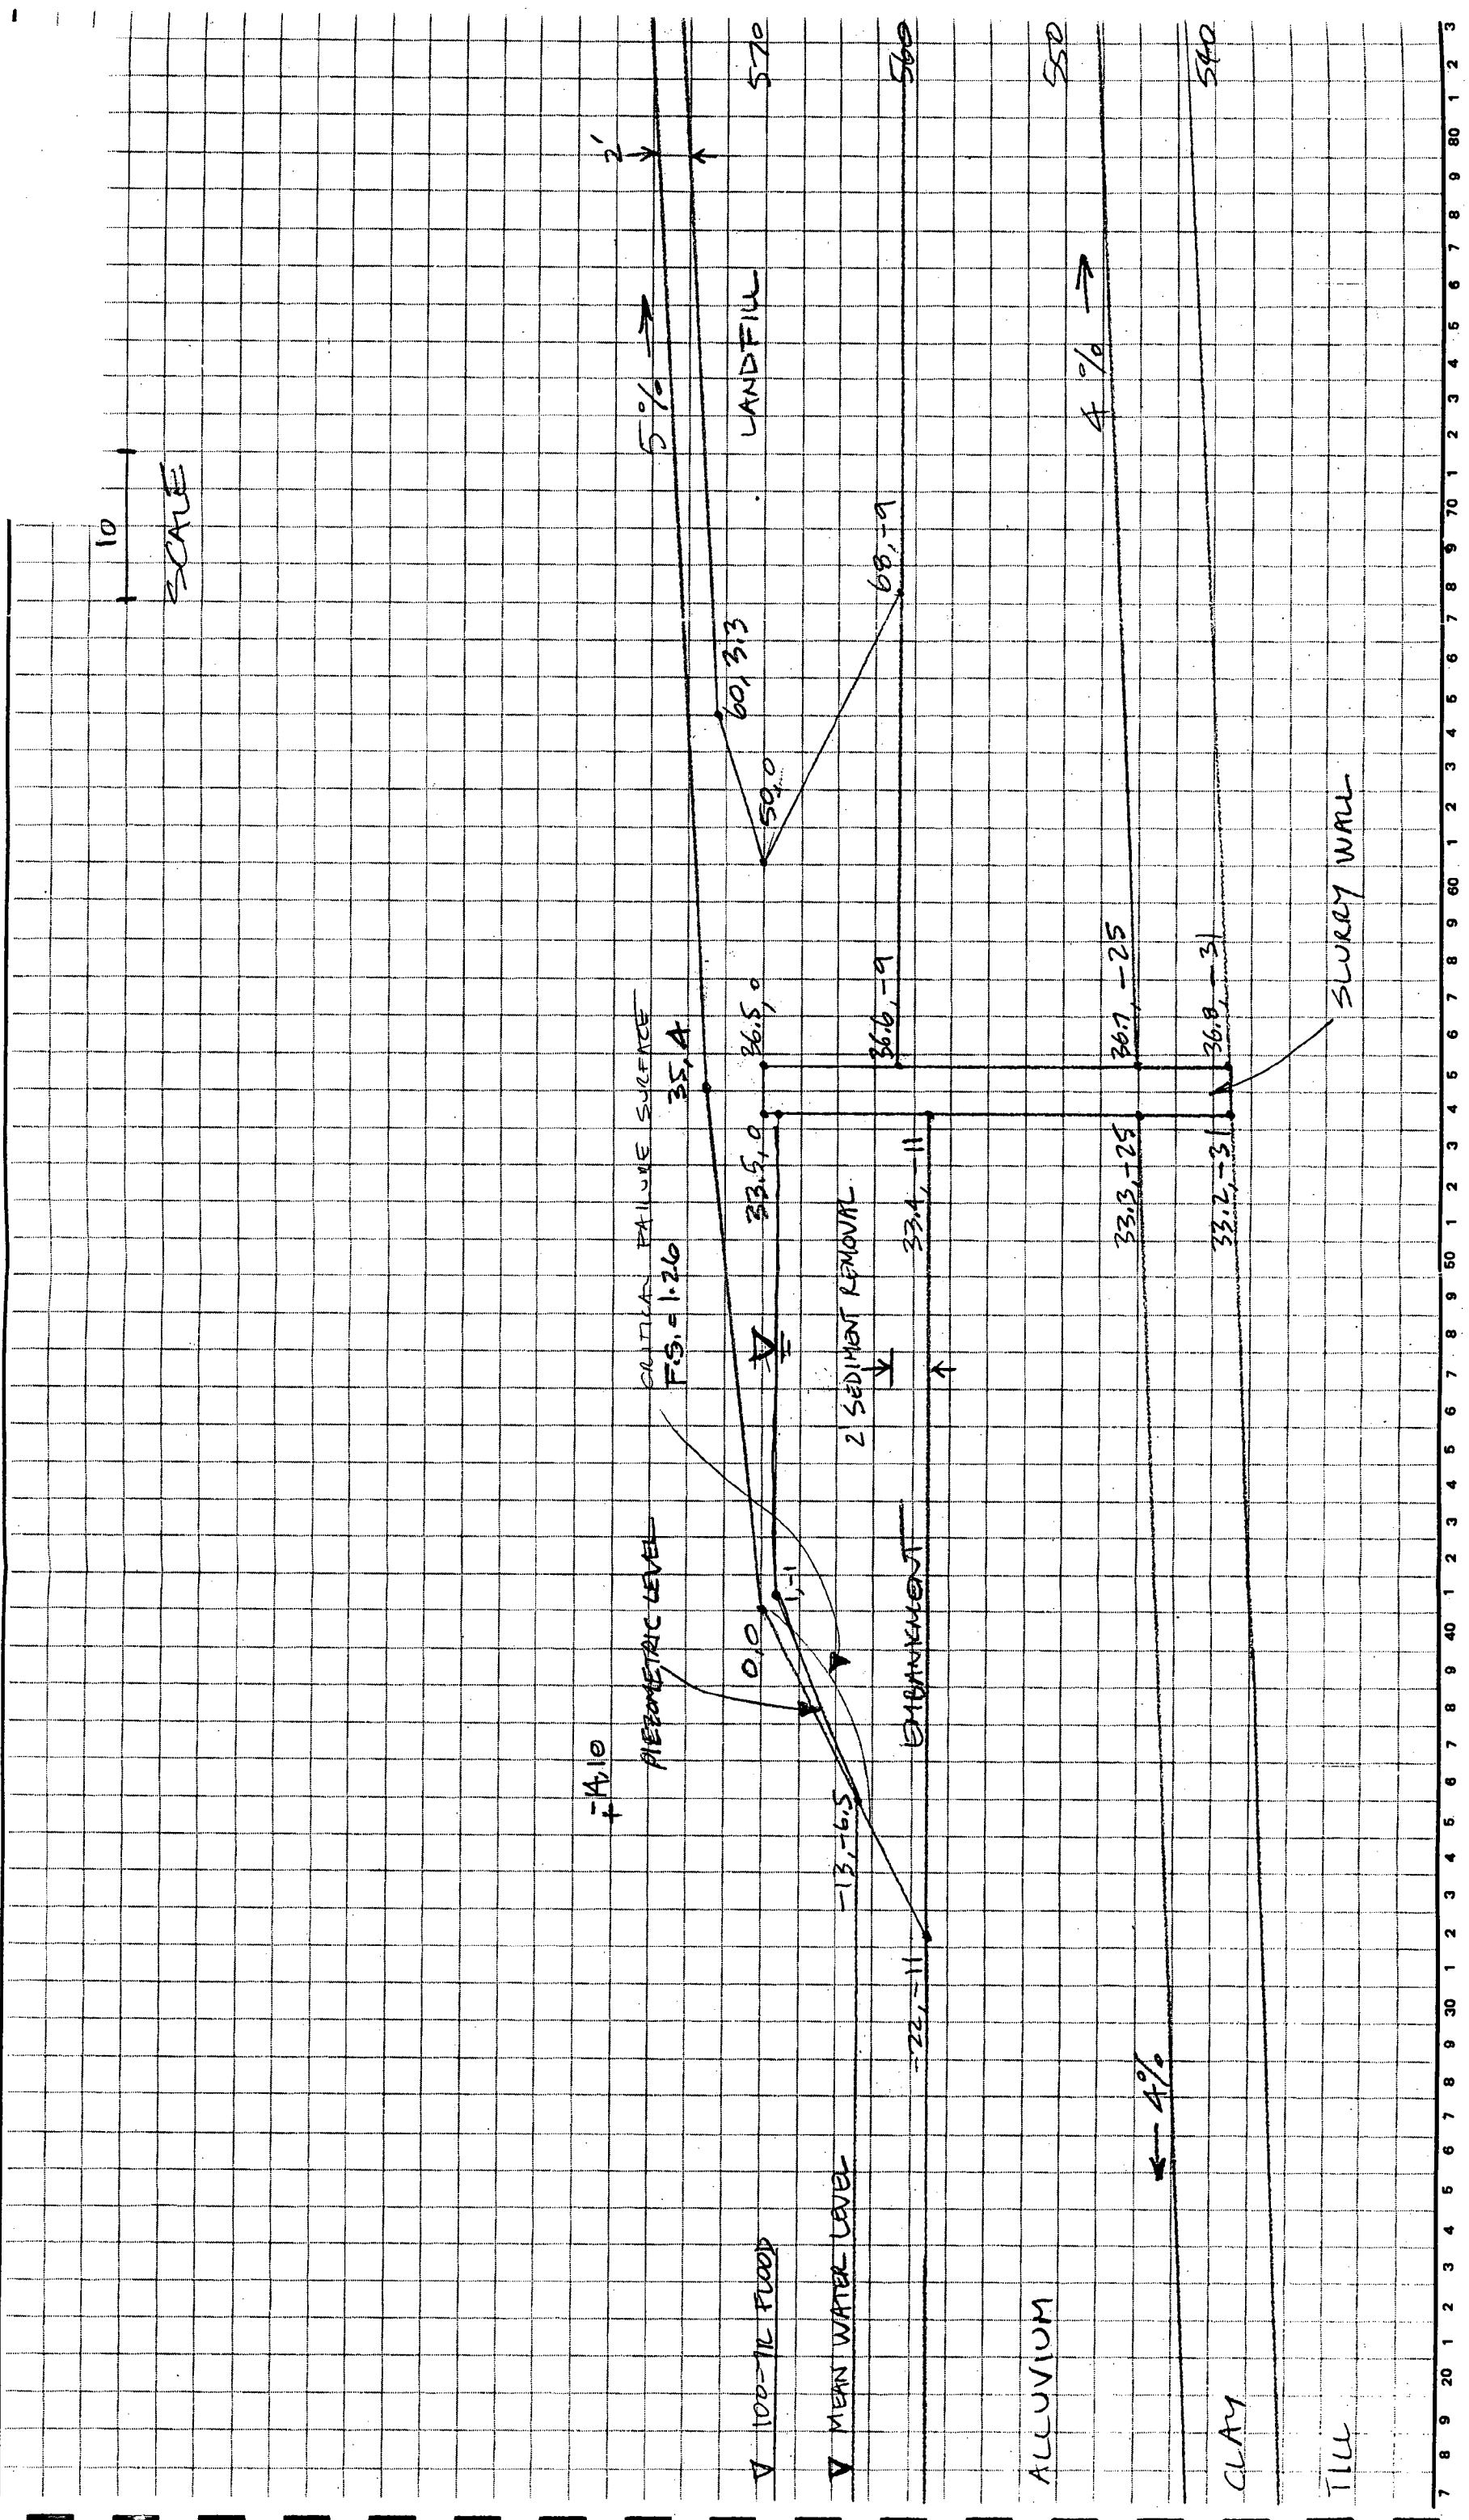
BULKHEAD, EAST END OF OXYCHEN PROPERTY, CROSS SECTION NO. 2
